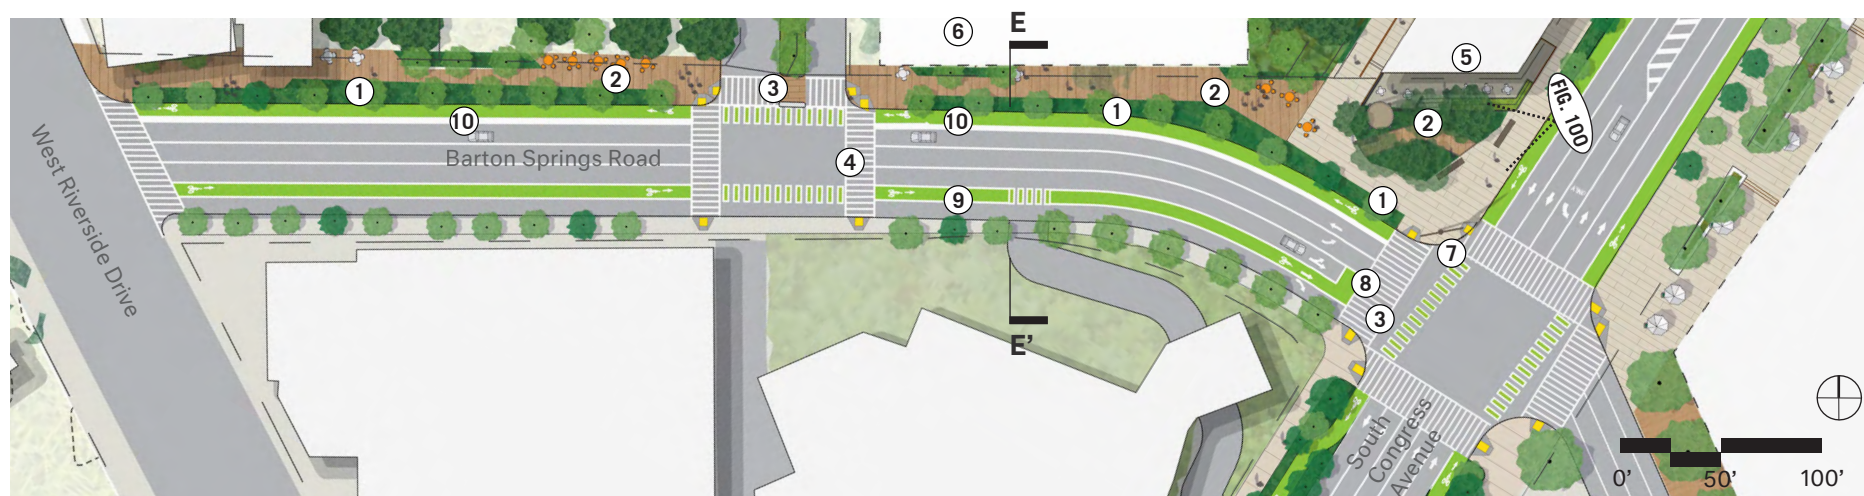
Enlarged plan of the concept design for Barton Springs Road streetscape.
